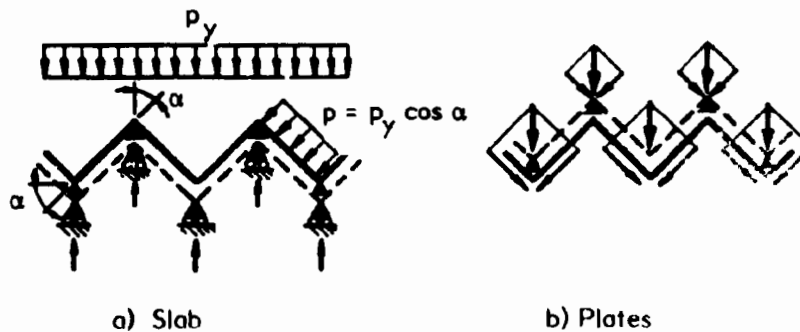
FOLDED PLATE SECTION AS A COMPOSITE OF SLAB AND PLATE STRUCTURE
